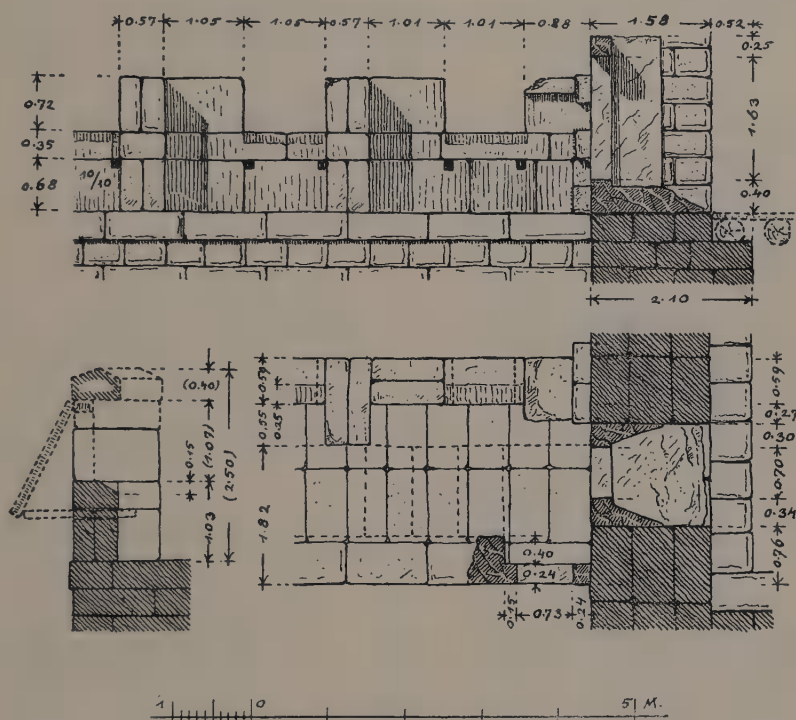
Curtain 14—15, *Epalxis*. Plan, Section, and Inside Elevation.
